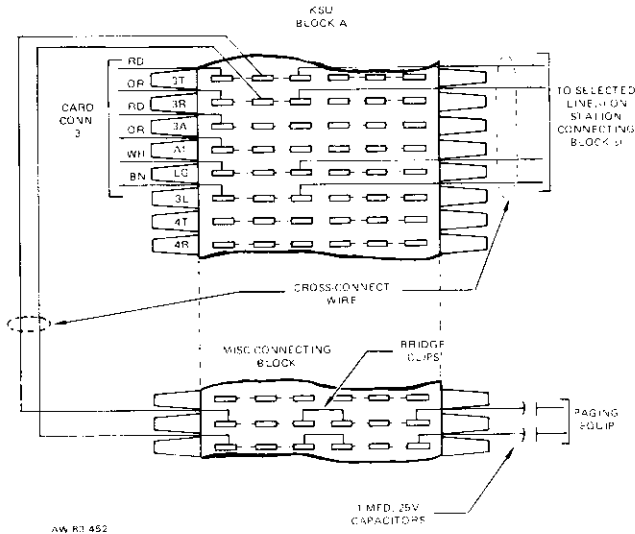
Connecting Details, Intercom KTU to Paging Equipment
